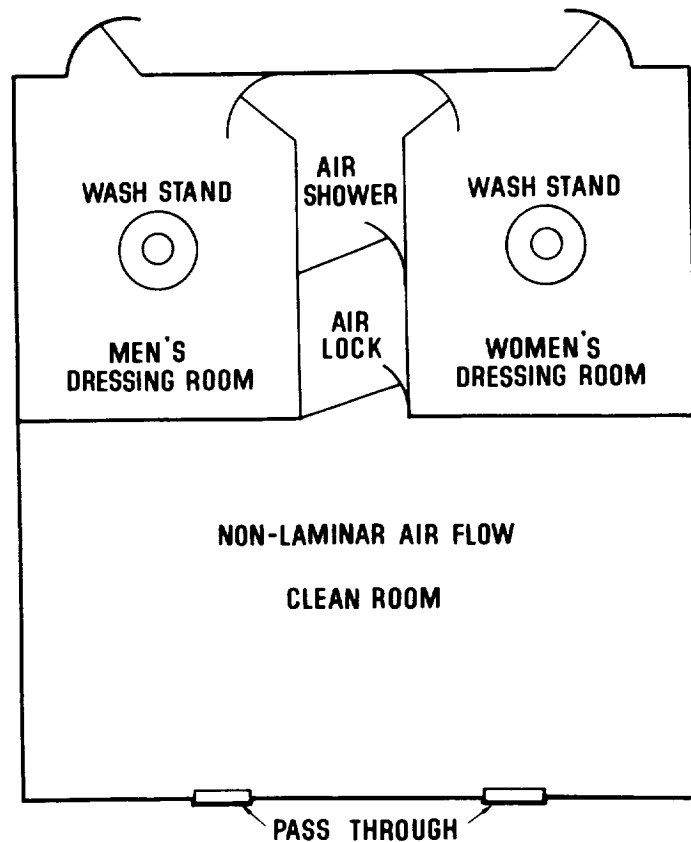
Typical floor layout for a nonlaminar airflow clean room
